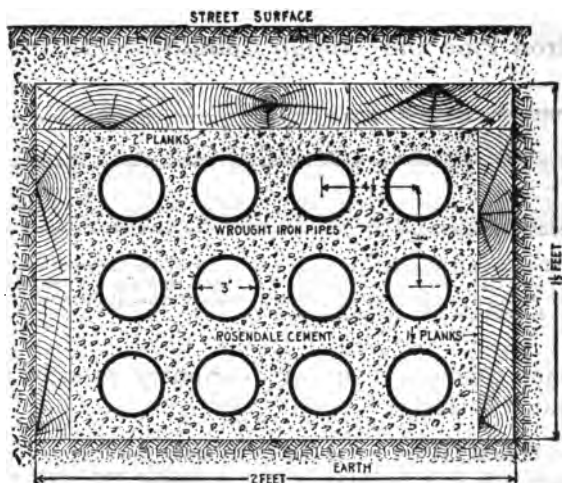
,353.—Cross section of wrought iron pipe conduit laid in hydraulic cement.
